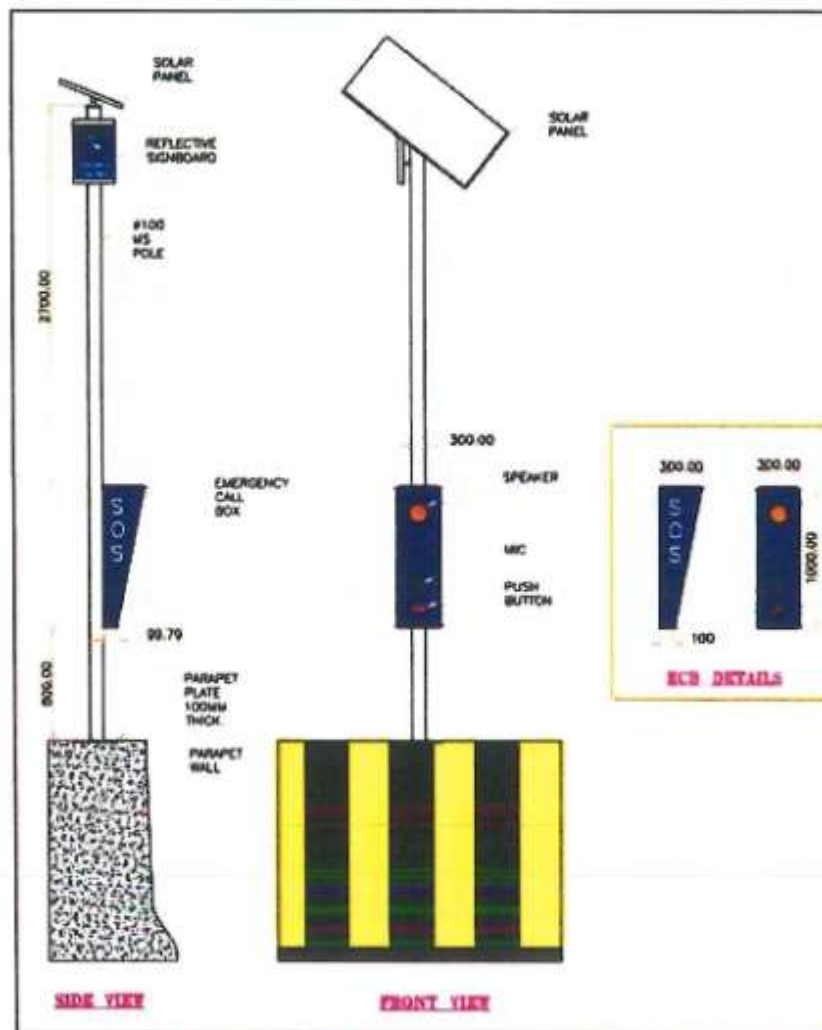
2 – Indicative Installation Drawing Of ECB on Parapet Wall
